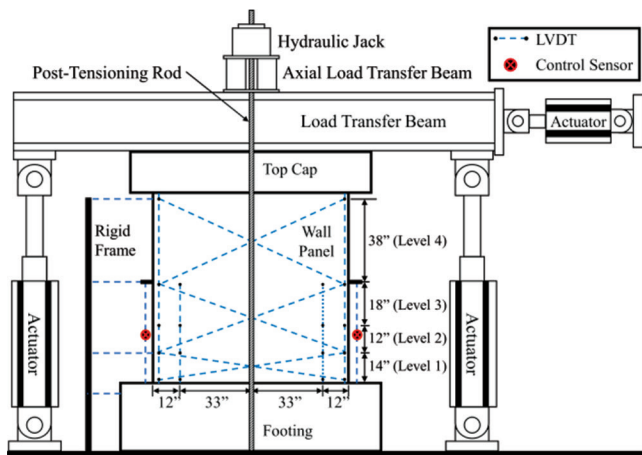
Test setup and instrumentation layout. (Note: 1 in. = 25.4 mm.)
